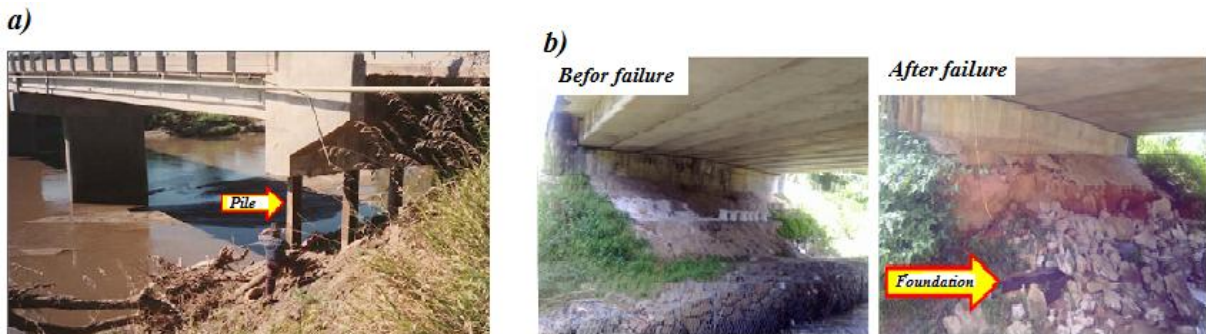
Exposed pile and foundation after erosion of abutment protection Atlanta metro area (Sturm et al., 2011); b) Kurau River, Perak, Malaysia
